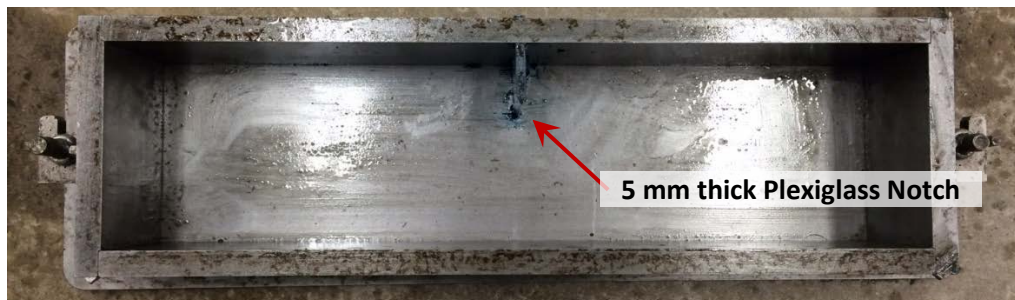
Steel molds with Plexiglass notches for fracture-mechanics test.
